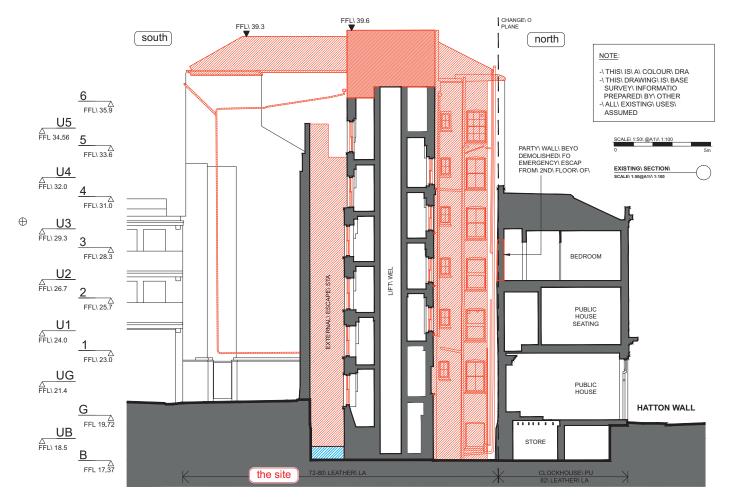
East facing section showing area of basement excavation below external escape stair in the south lightwell (Smith Caradoc-Hodgkins Architects Project no. 723 DWRG no. A021. Rev. B 01-09-2016)
